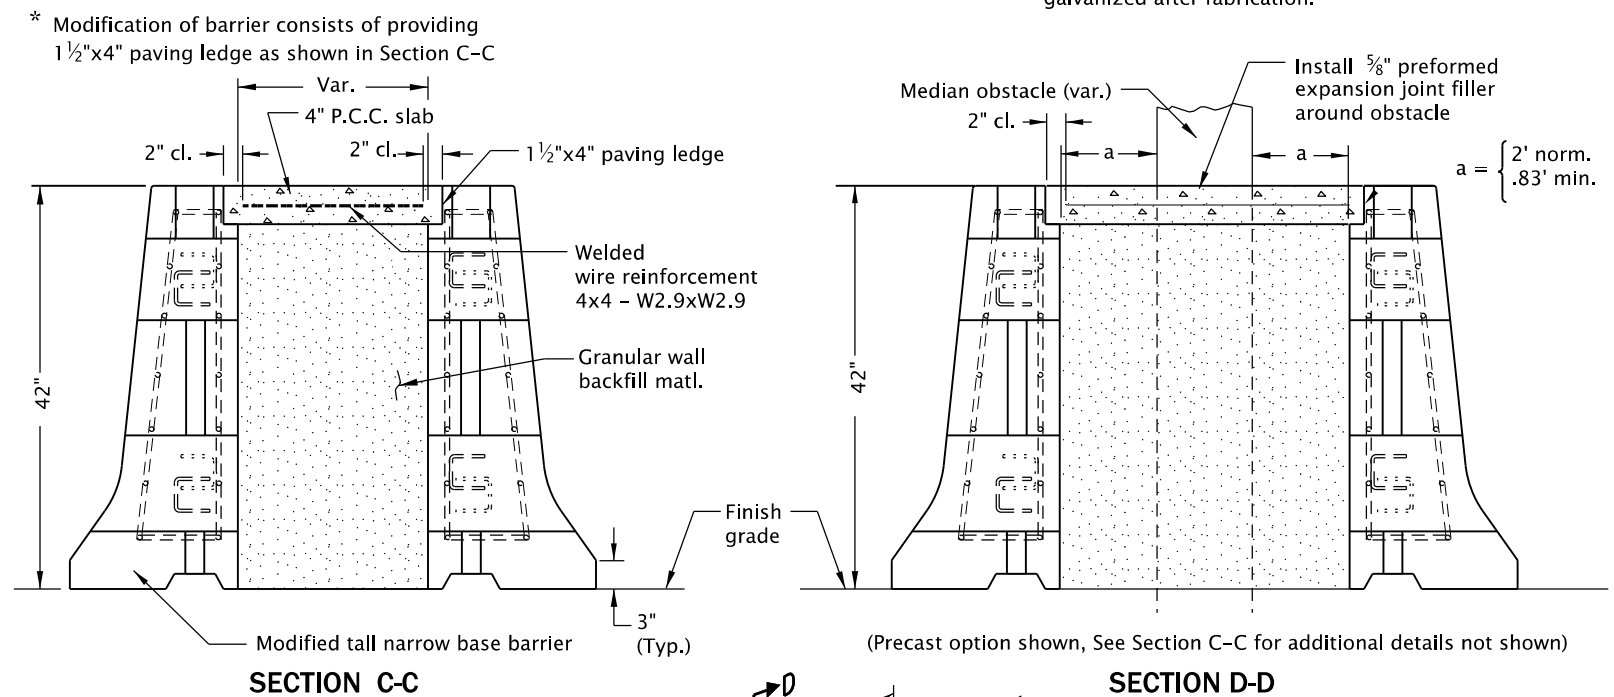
DETAIL WHEN CONNECTING TO PRECAST BARRIER
